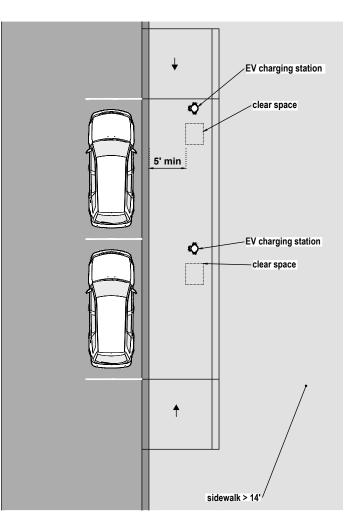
Example of EV Charging Station in an unconstrained location, where the sidewalk is over 14-feet wide (Source: United States Access Board)
